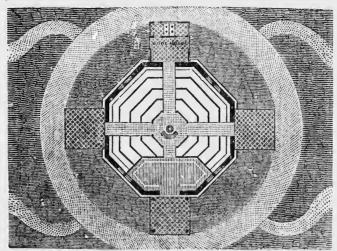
GROUND PLAN OF AN OCTAGON RUSTIC SCHOOL-HOUSE AND GROUNDS WITH WALKS.
